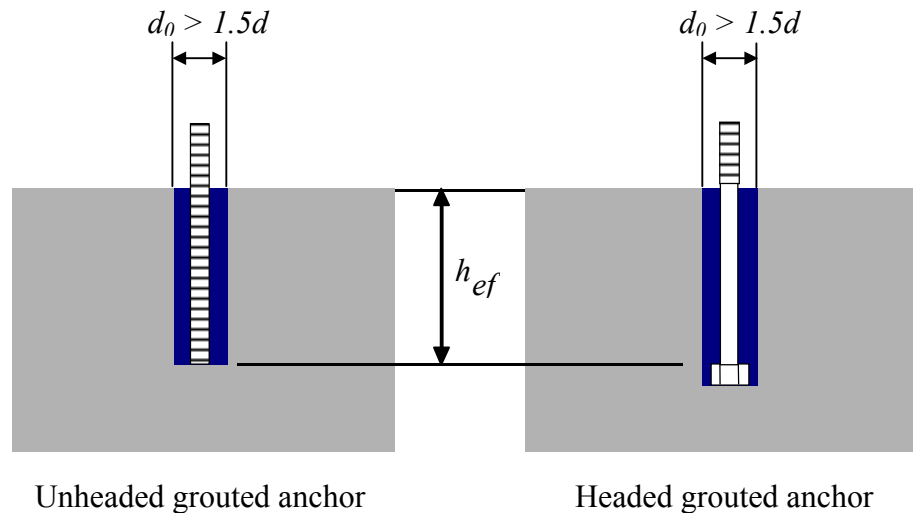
Examples of typical unheaded and headed grouted anchors
